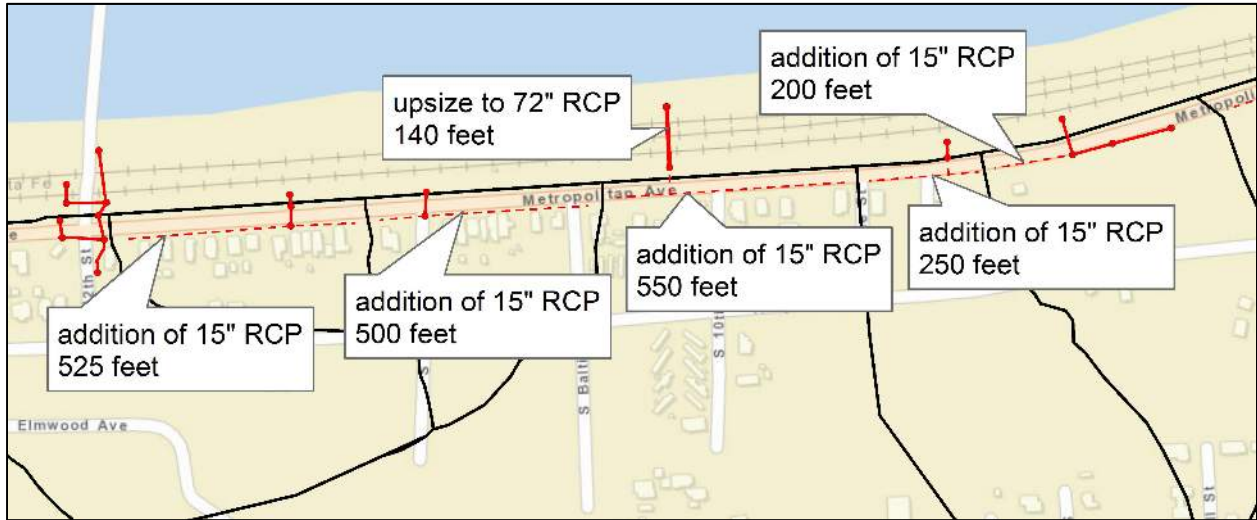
ARGE-1 Proposed Stormwater Network Upsizing for 5-Year Event, West Section.
